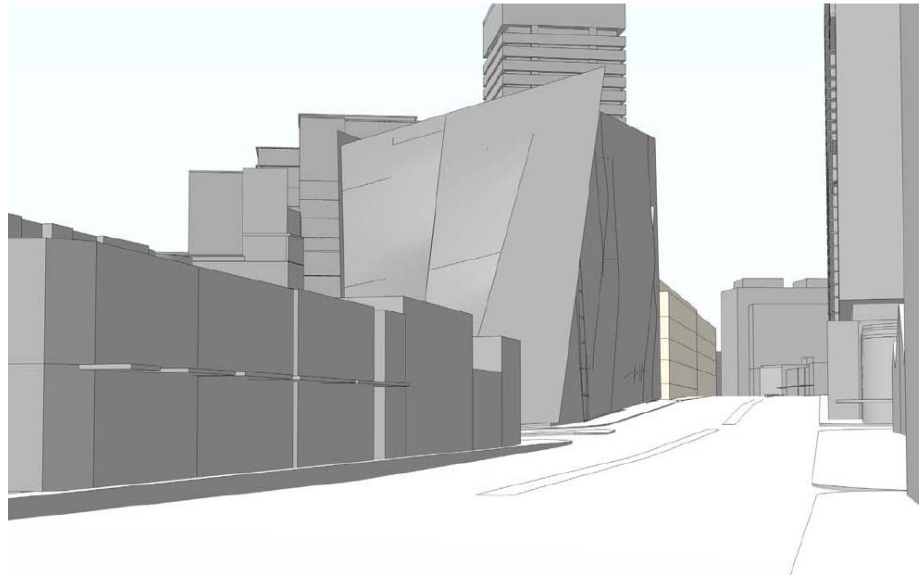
View east along Broadway with proposed amended Building 2 envelope modelled
